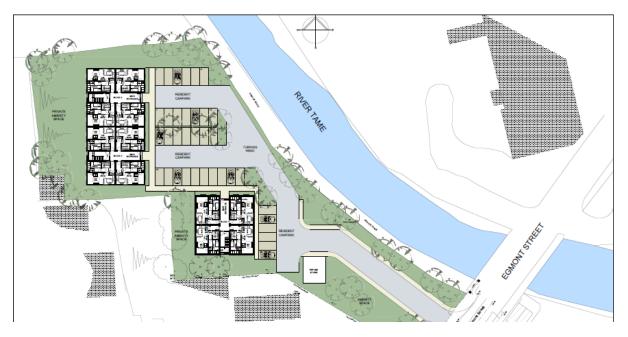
Site plan for the proposed Egmont Street, Mossley residential development
